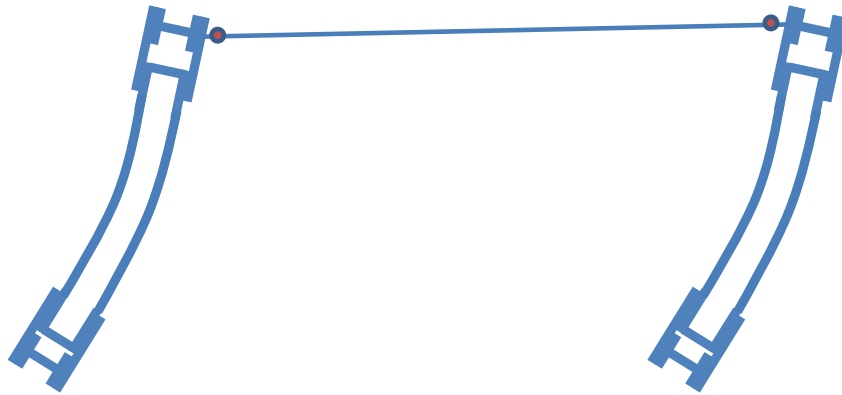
Truss cross section rotation at 24 feet of truss with 2 lateral braces - $K = 0.8$ kip/in
